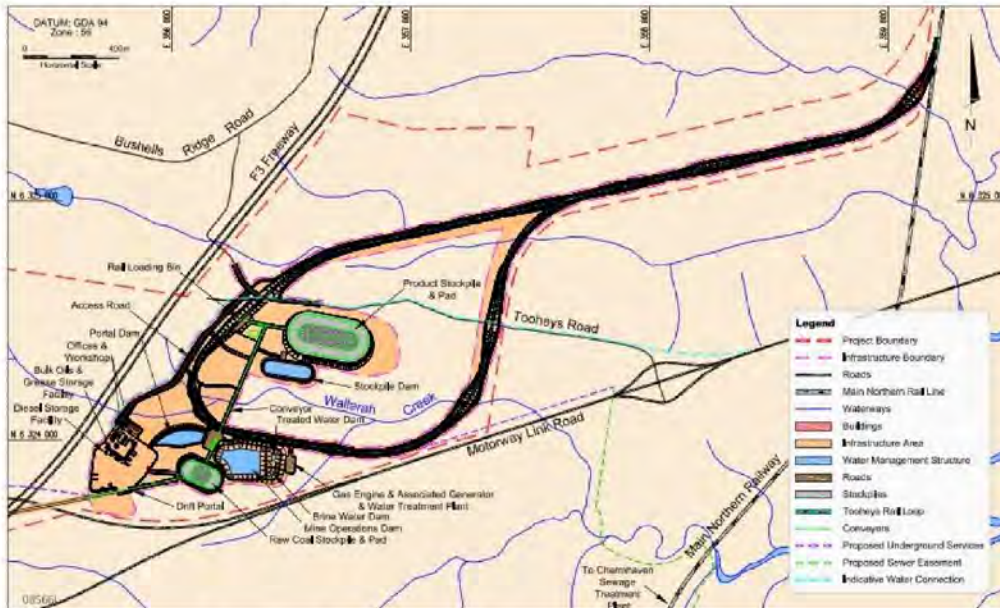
Tooheys Road Site (Source: Hansen Bailey, 2013a)
